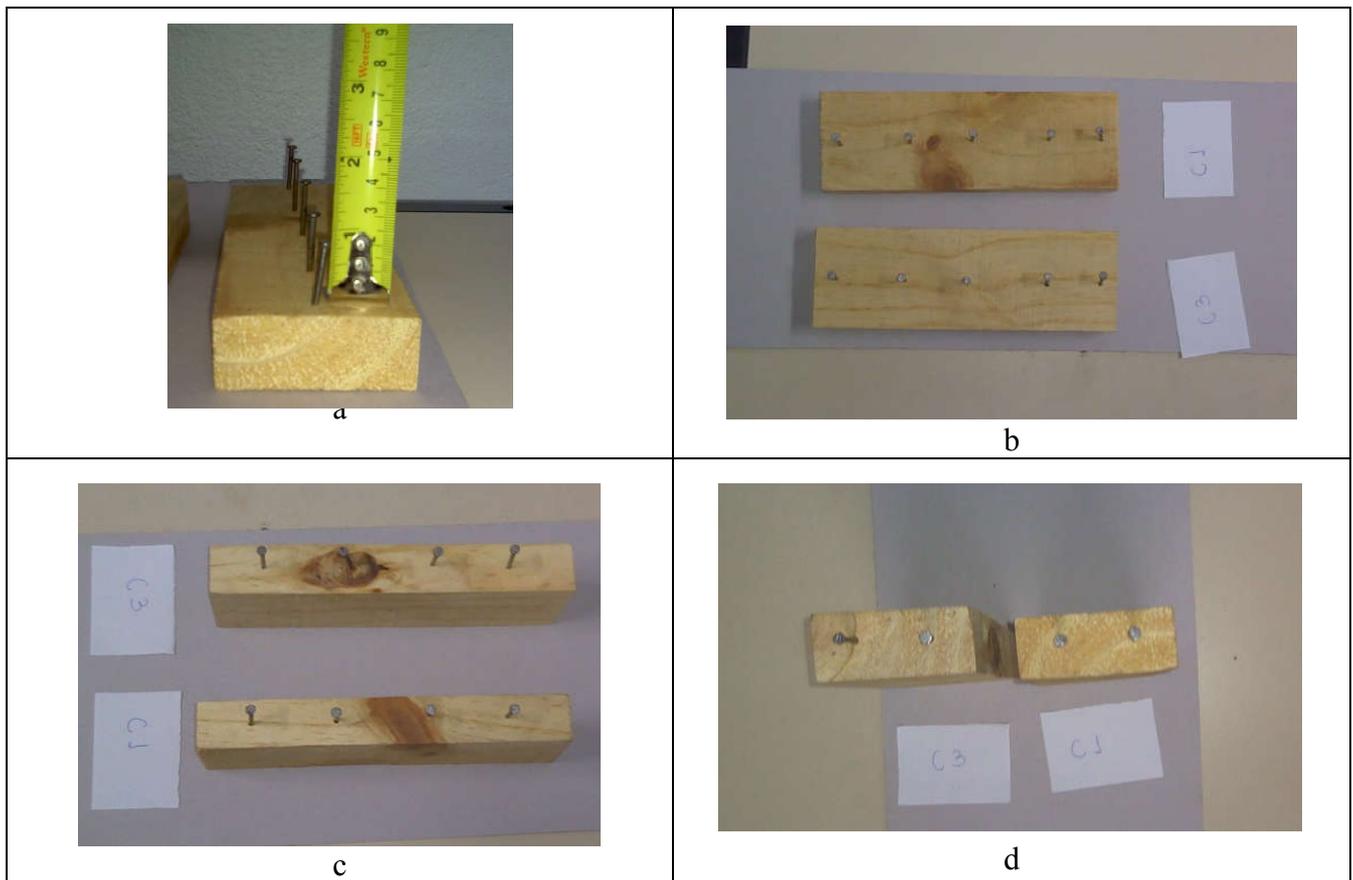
Holes produced on the surfaces (a) Holes on the largest lateral faces, lateral view; (b) Holes on the largest lateral faces, view from above; (c) Holes on the smallest lateral faces, view from above; (d) Holes on the top and bottom, view from above. Author's collection
